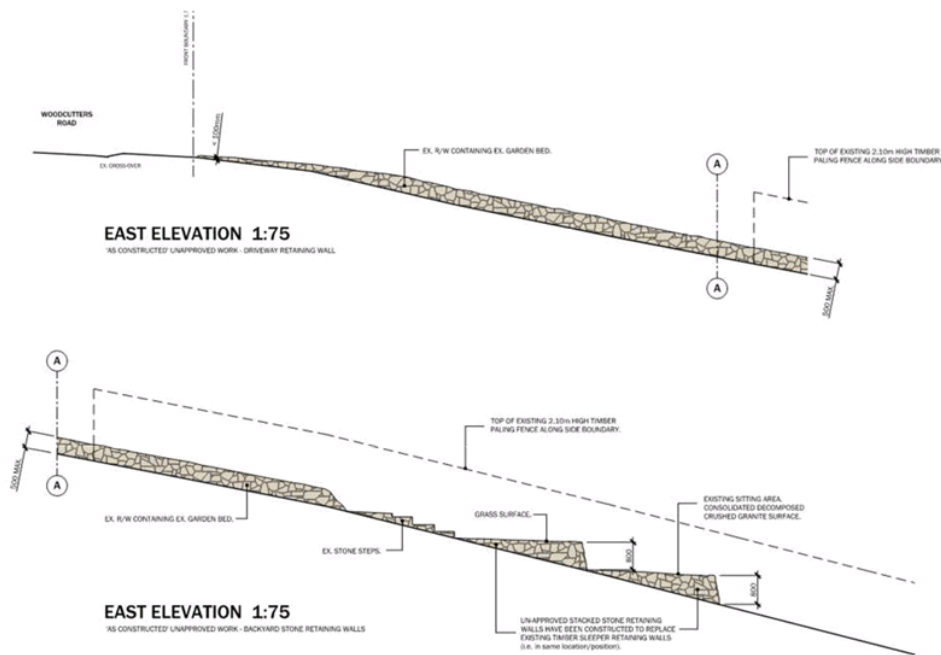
retaining wall running parallel to the side boundary shared with 121 Woodcutters Road
